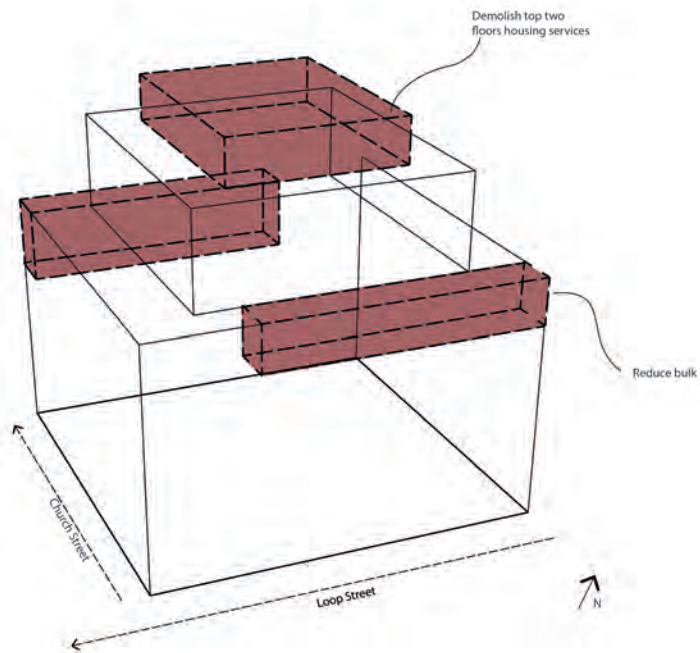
The top two floors are demolished and some of the sides are cut back to reduce the bulk of the building
